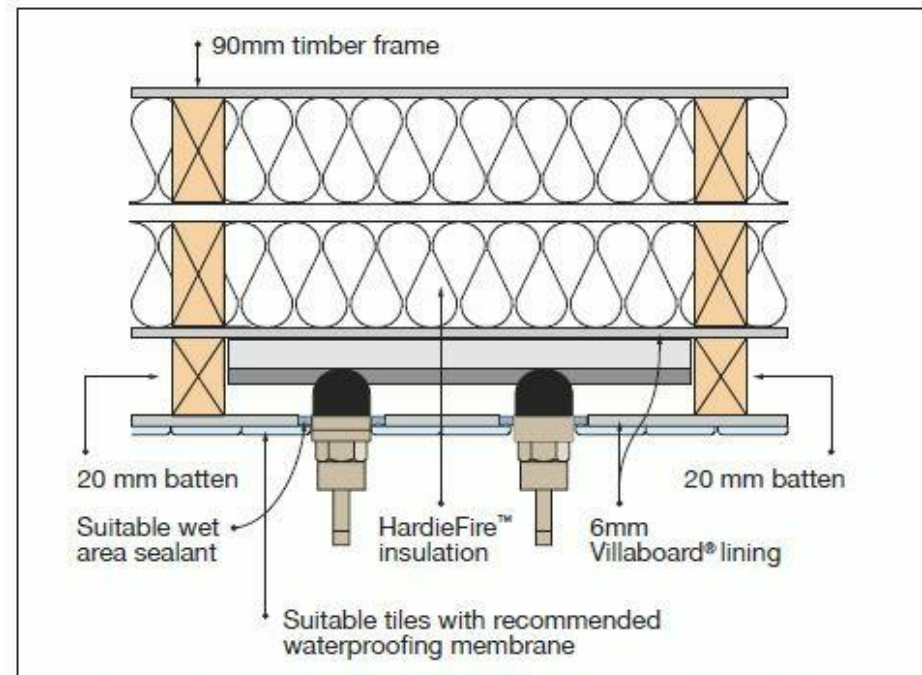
HARDIESMART™ INTERTENCY WALL SYSTEM PLUMBING PIPE PENETRATION - PLAN
